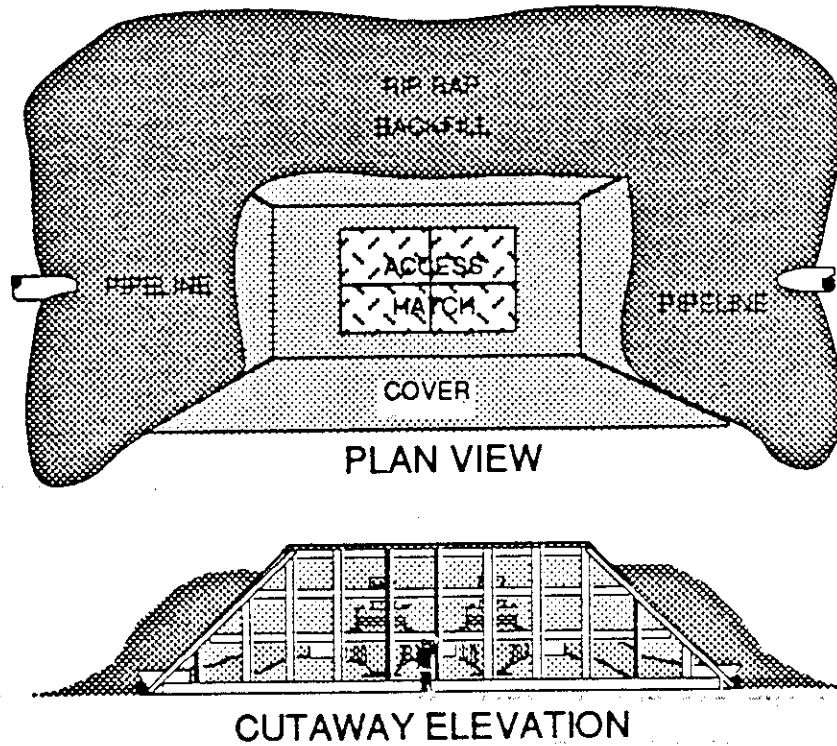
A plan and elevation view showing a cutaway of the assembled box with the valves in place.
